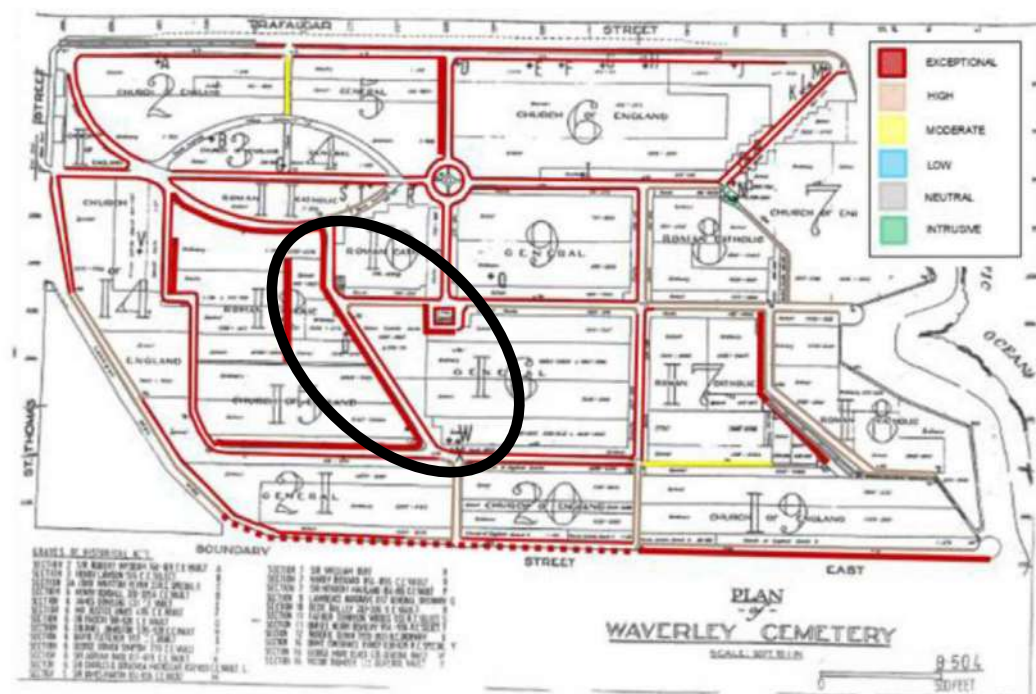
Plan of Waverley Cemetery showing layout of site and designation of walls and edges of significance. The outline indicates the location of the proposal (Source: Waverley Cemetery)
